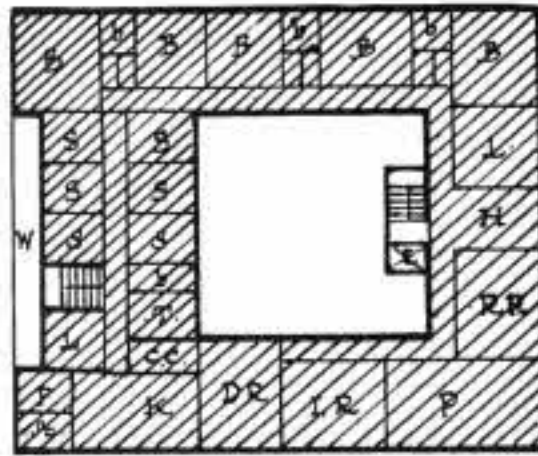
Key Floor Plan—One Large Apartment to the Floor, Built Around a Central Courtyard.
